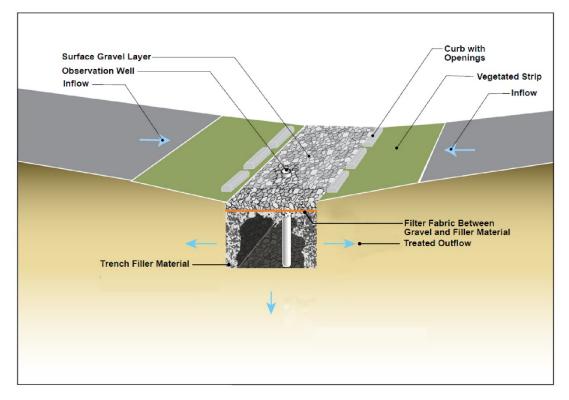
Typical Cross-Section of an Infiltration Trench¹
